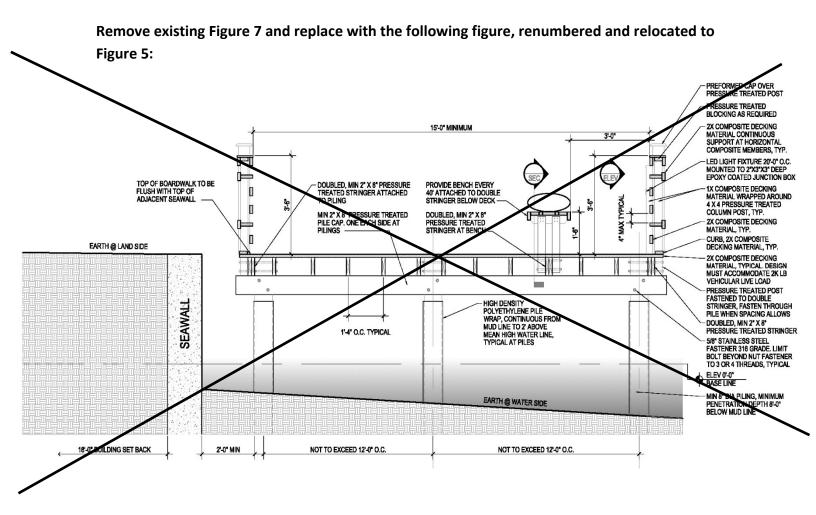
Typical Boardwalk Section at 1/2" - 1'-0" Scale
